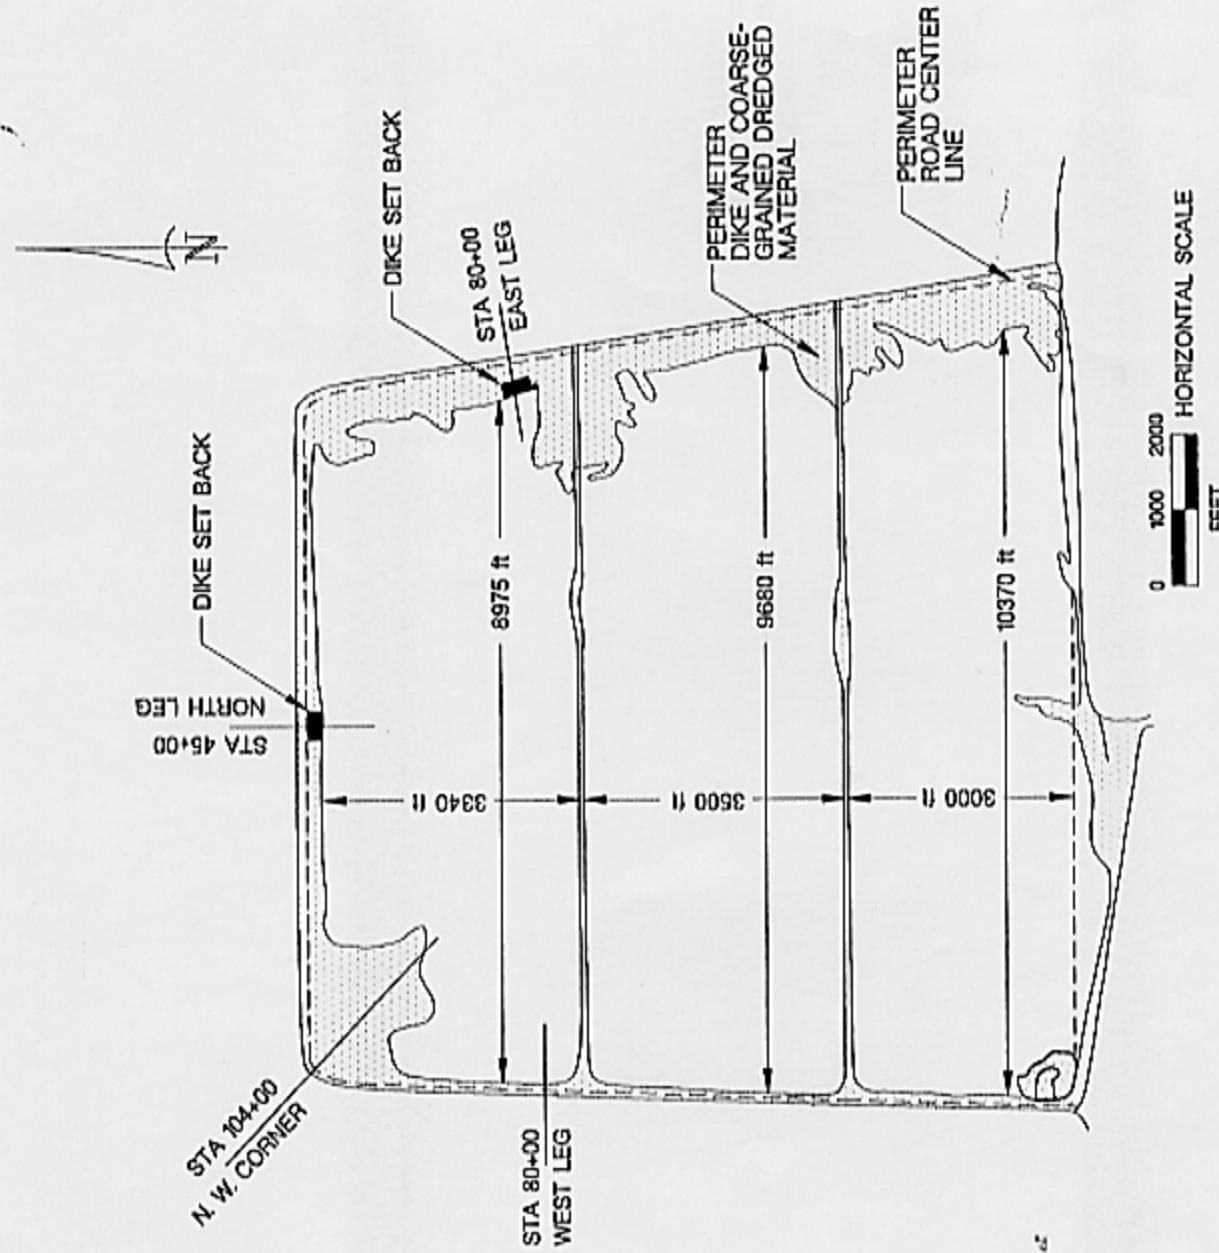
Plan View of Craney Island and Location of Dike Cross Section
